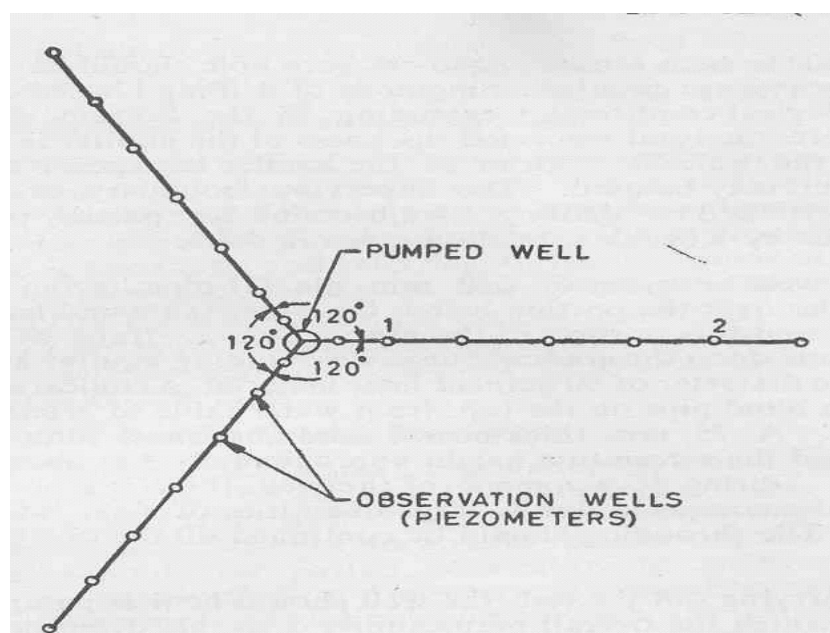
PLAN SHOW ARRANGEMENT OF PUMPING WELL AND PIEZOMETERS FOR PUMPING
